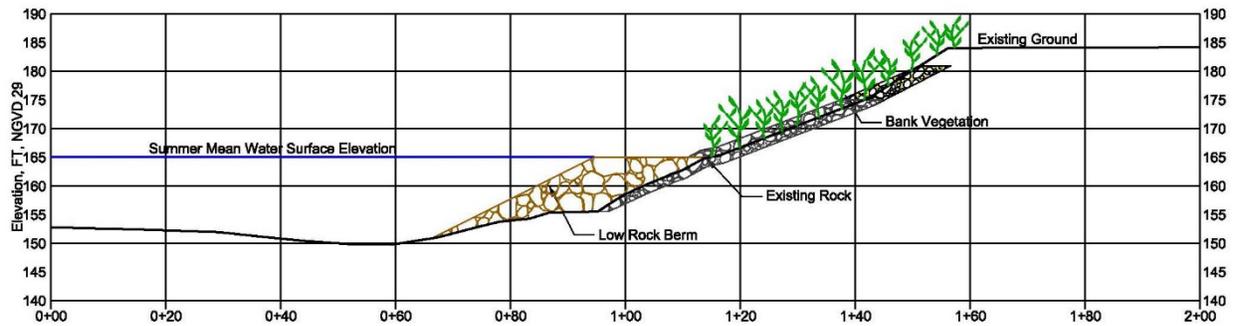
Cross Section showing Low Berm with Rock Armor at the City of Corning Sewer Outfall
